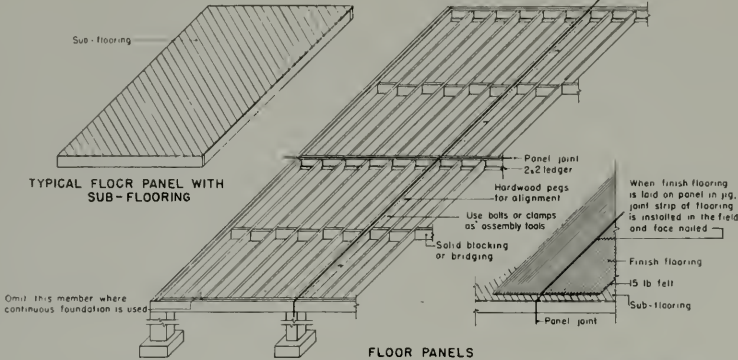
DETAILS FOR MODULAR LAYOUT OF FIELD FABRICATION BY JIG ASSEMBLY
